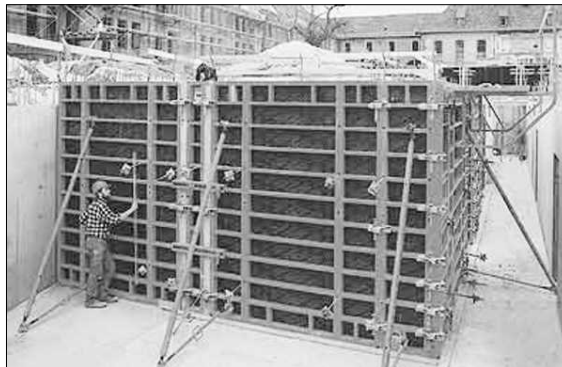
Trio 330 Panel Formwork (Courtesy PERI).
